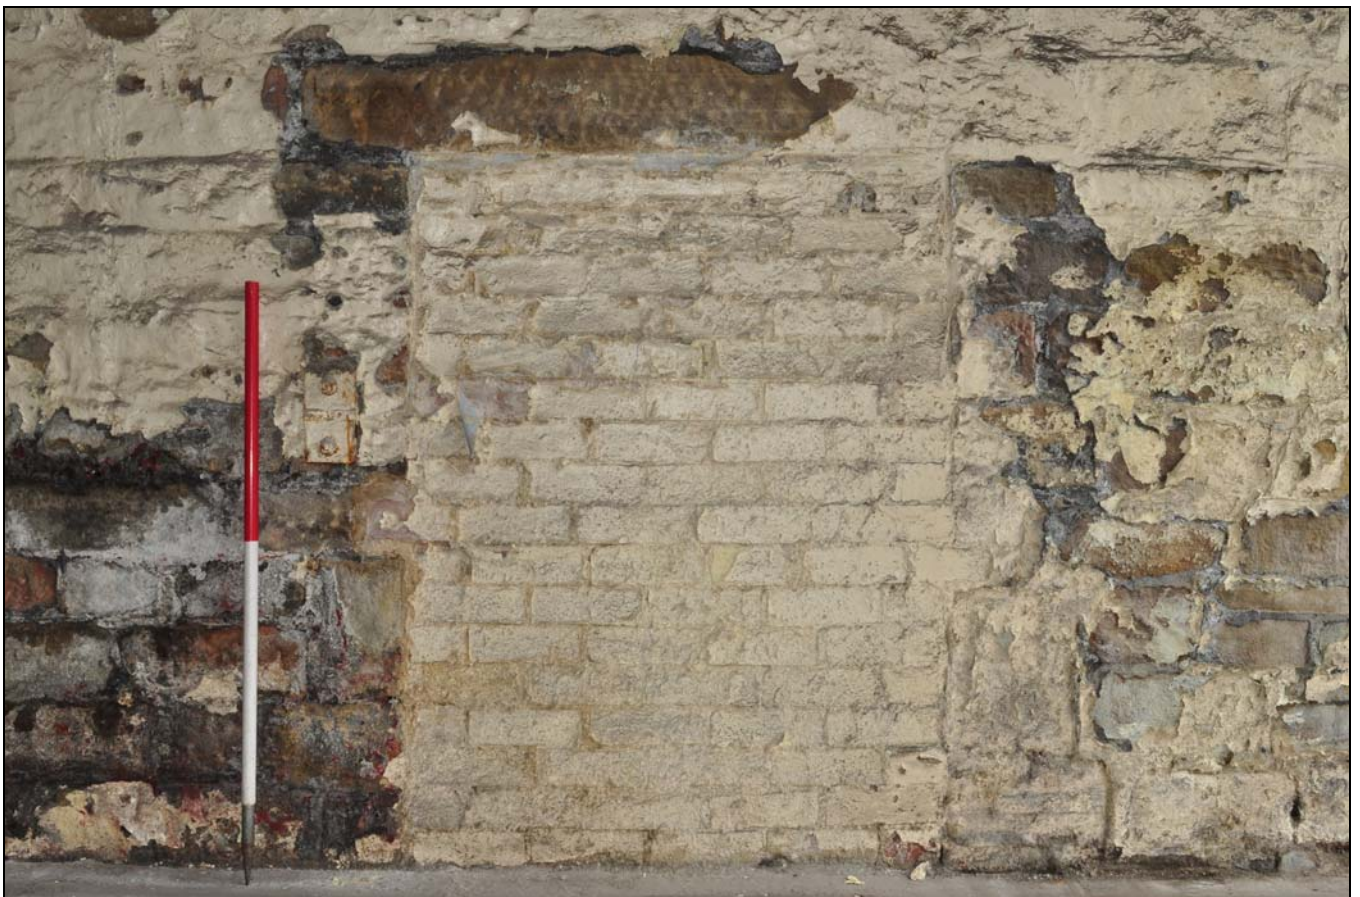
Blocked opening in south-west side of boiler house, from the north-east
